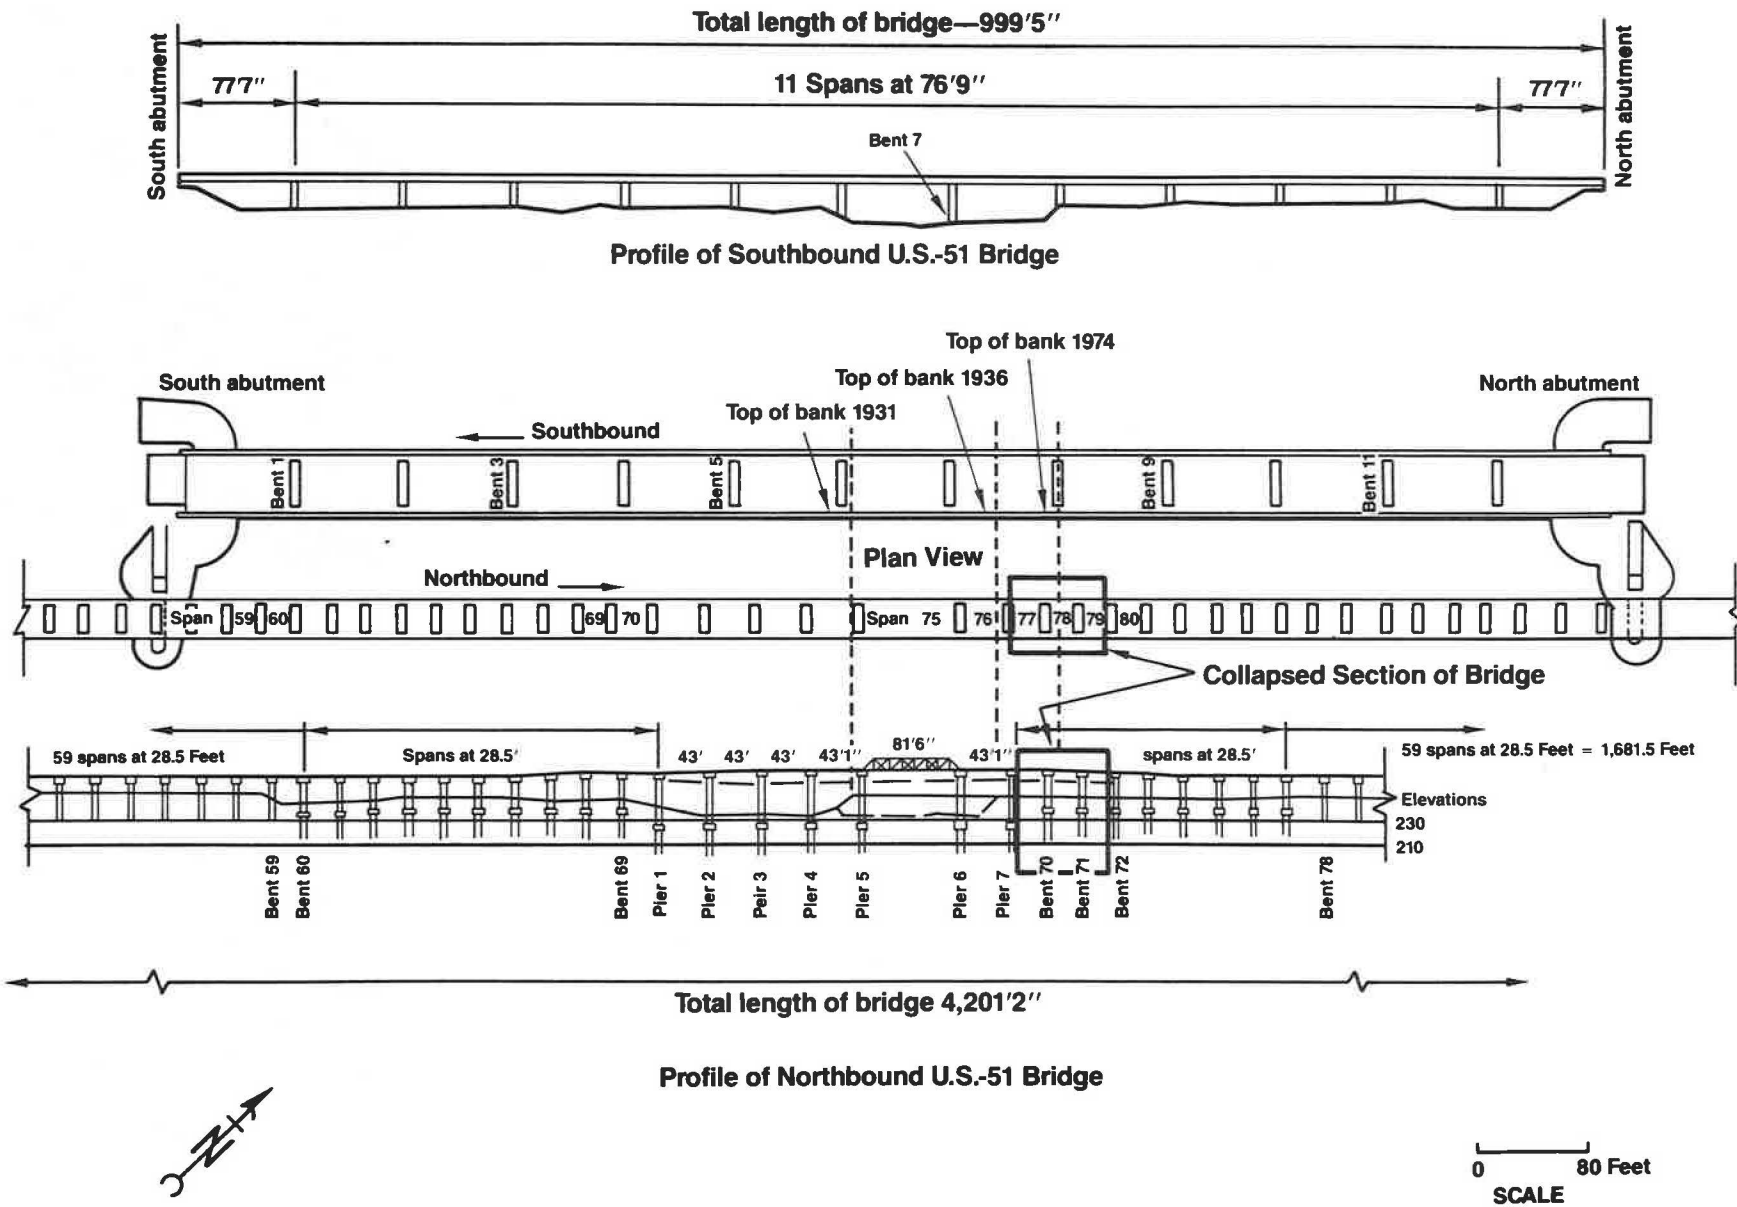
Layout of bridge (1931 and 1974) (NTSB 1990).
